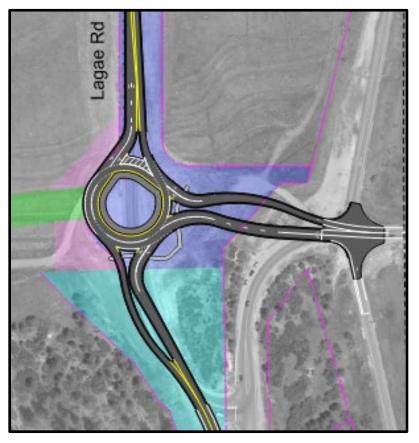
Lagae Road/Happy Canyon Road Intersection Improvements
